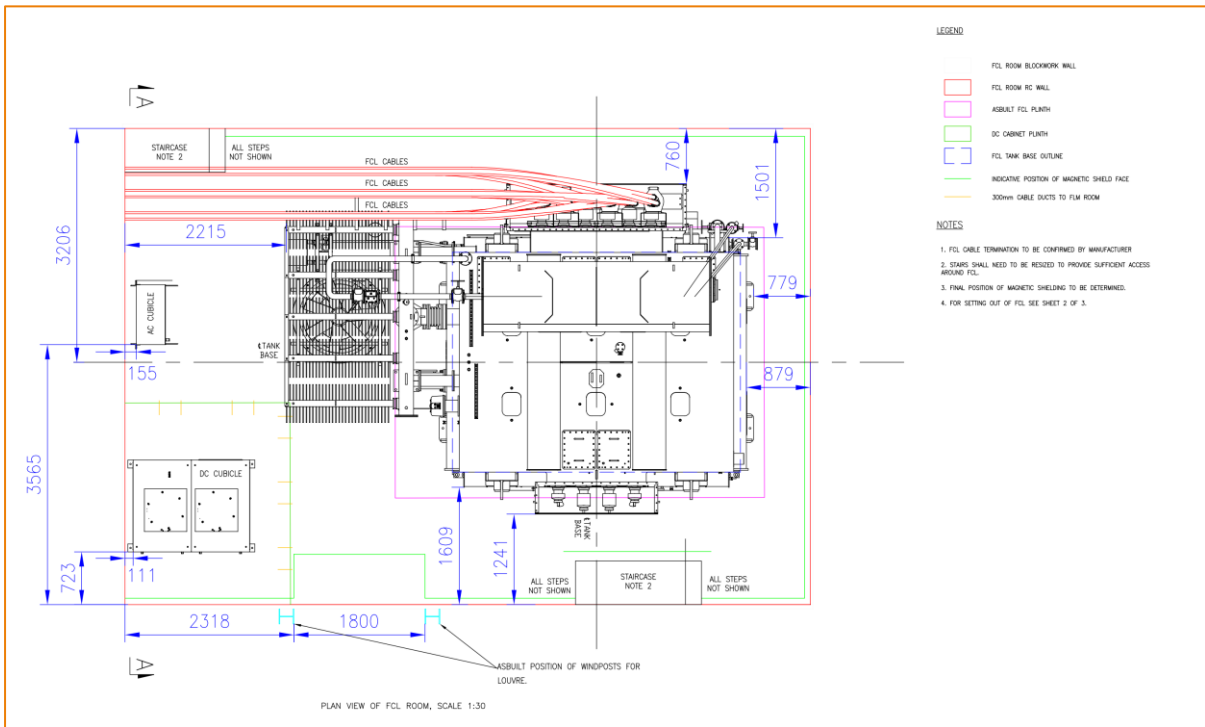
Initial layout of new equipment for Castle Bromwich
